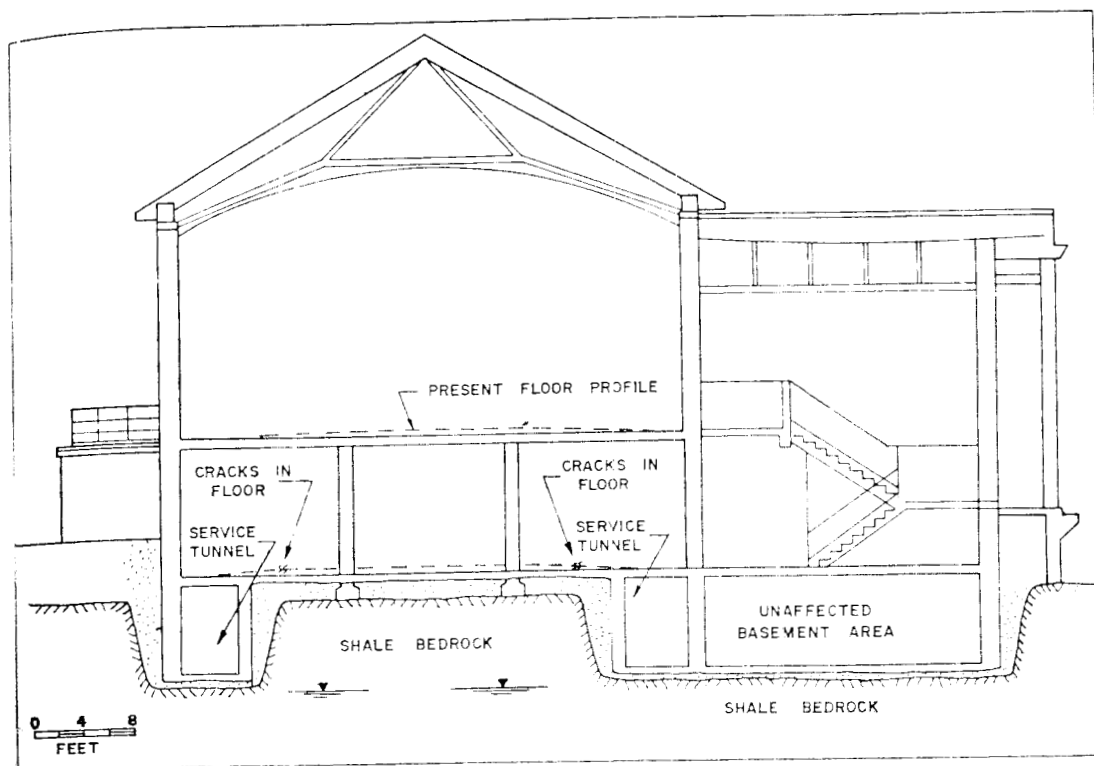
Cross section showing heave of ground floor slab and uplift of second story floor.
